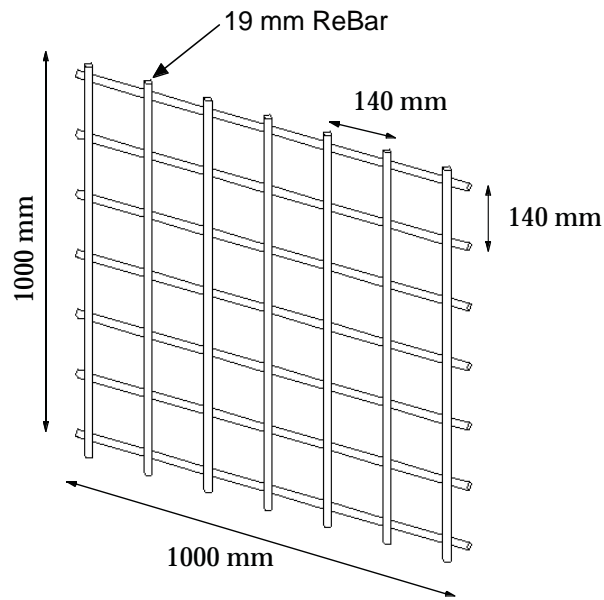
Bare rebar grid (the same as used in reinforced concrete specimen RC881). Seven 19 mm bars each in the horizontal and vertical directions were used to create a square mesh with 140 mm spacing between bar centers. This left open areas measuring 121 mm square for an open area to solid ratio of 75.2%
